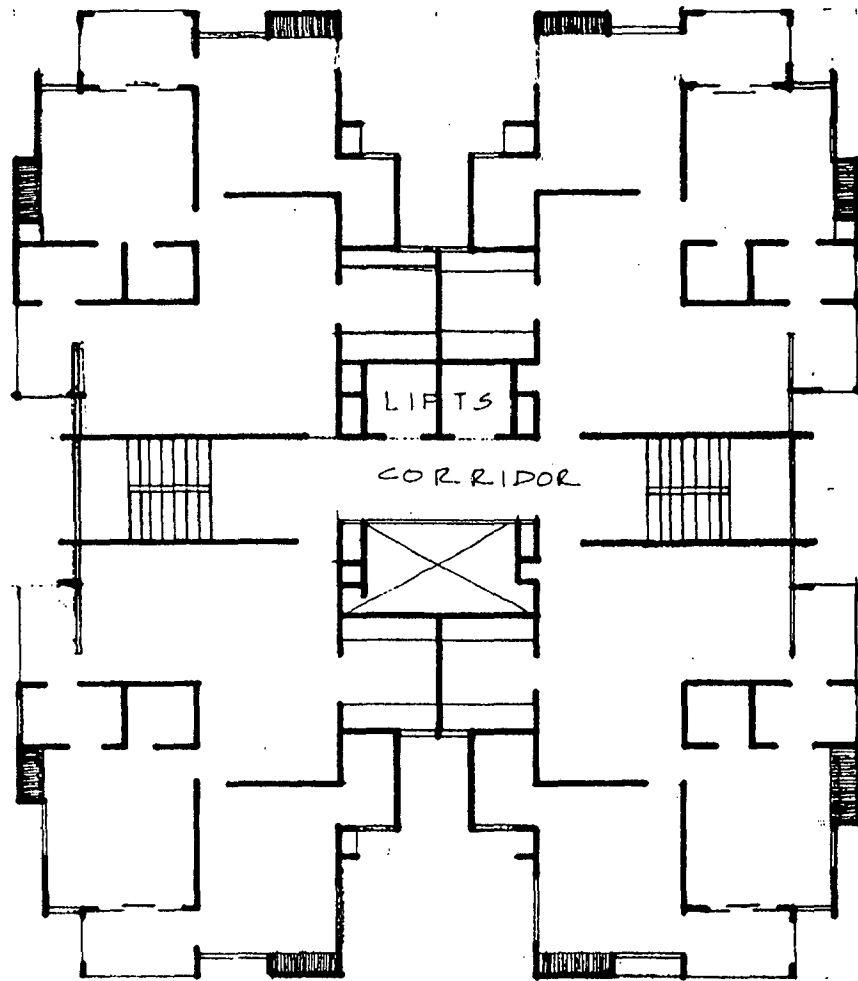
TYPICAL FLOOR PLAN (ANUPAM TYPE-B)
